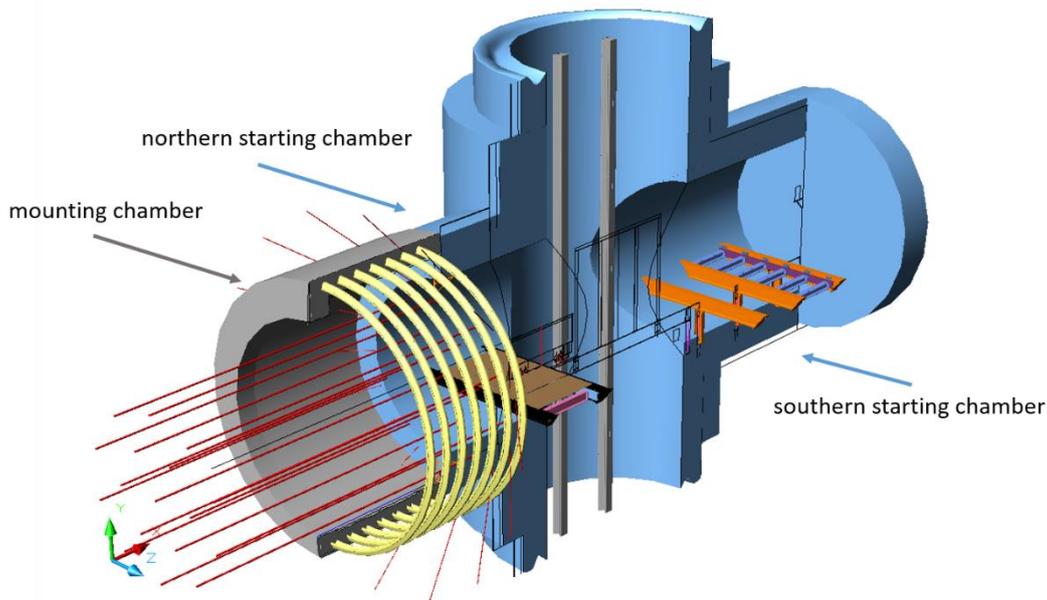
View of the two starting chambers and mounting chamber for the assembly of the tunnelling machine.
